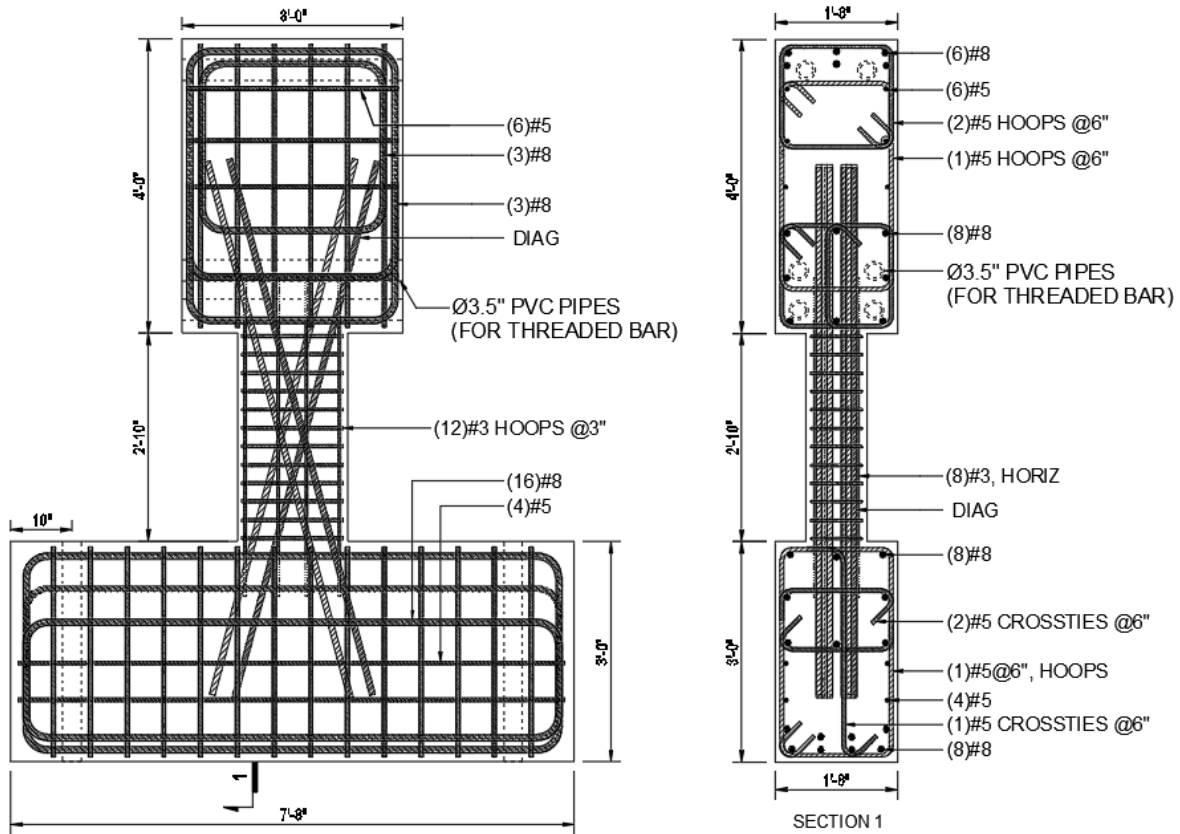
Nominal specimen dimensions and reinforcement (1 in. = 25.4 mm)
